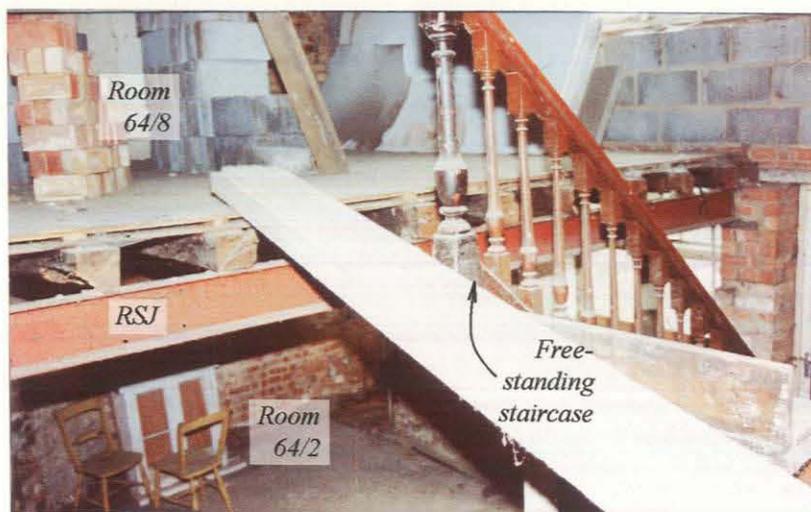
Rooms 64/2 & 64/8, no.64; looking southwest and featuring the steel, east-west aligned RSJ which supports the joists and remaining floorboarding which belong to Room 64/8. The ceiling area between the RSJ and the north wall of 64/2 & 64/8, has been completely removed.
